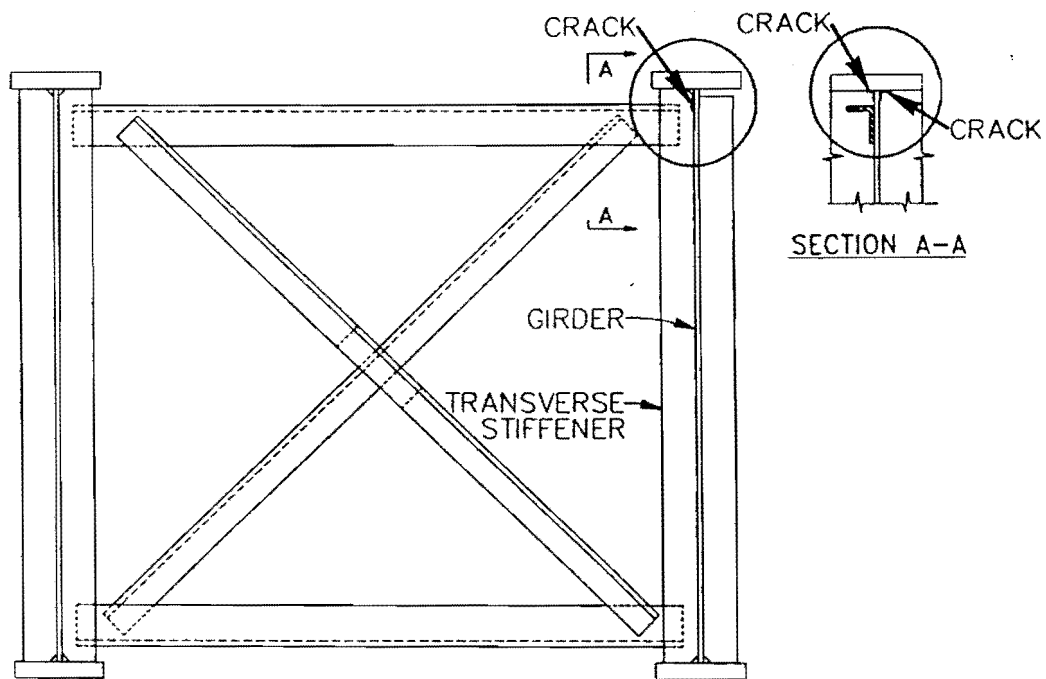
Type A1 fatigue cracking, web gap detail.
